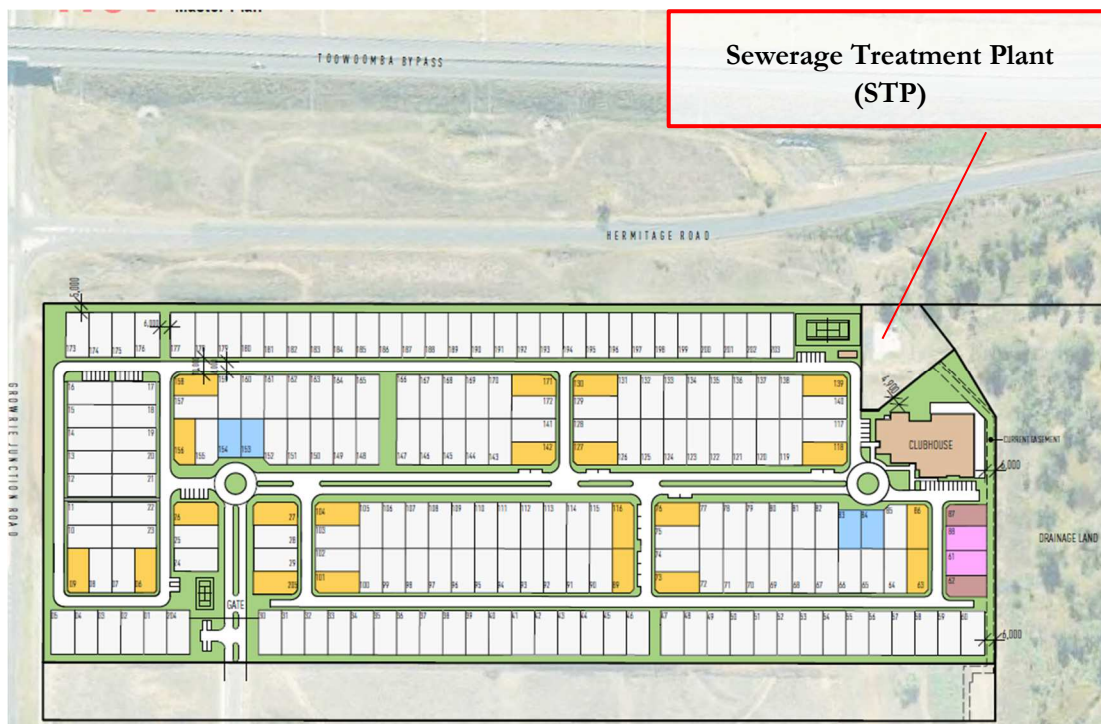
Proposed 205 Lot Residential Subdivision (Appendix A Development Plans)
